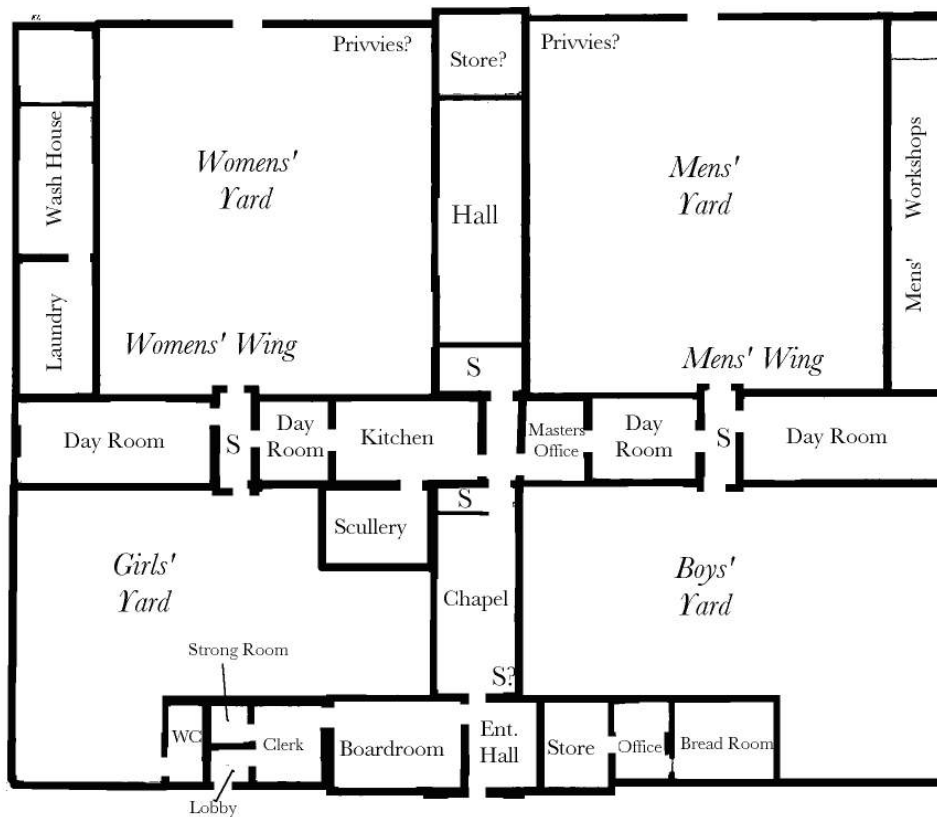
Possible reconstruction of the original ground-floor layout of Okehampton Workhouse as completed in 1838.
